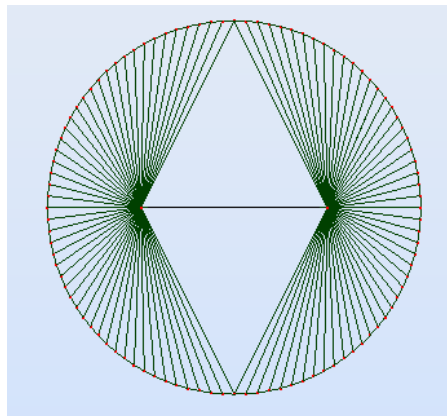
Cross section in the X-Z plane with a 65 foot radius.
